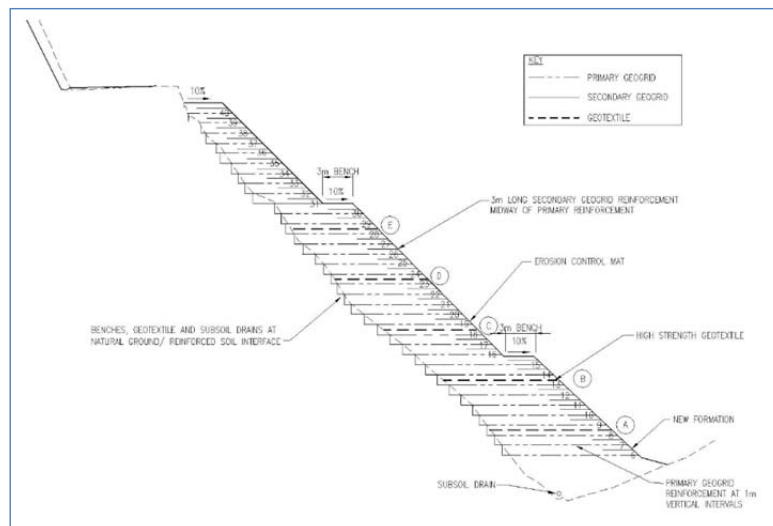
Typical Section of 45 m High RSE Buttressing an Existing Crib Wall and Steep Slope
